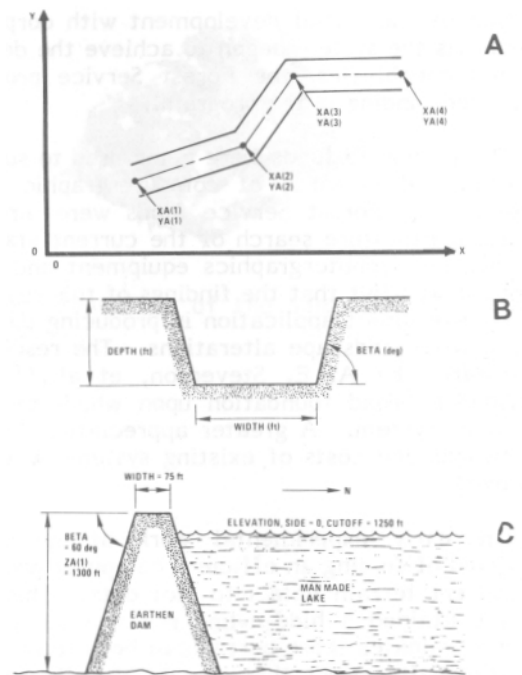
(a) Plan view of surface mine, (b) cross section view of surface mine looking from point 1 to point 2, (c) cross section of earthen dam and man-made lake.
